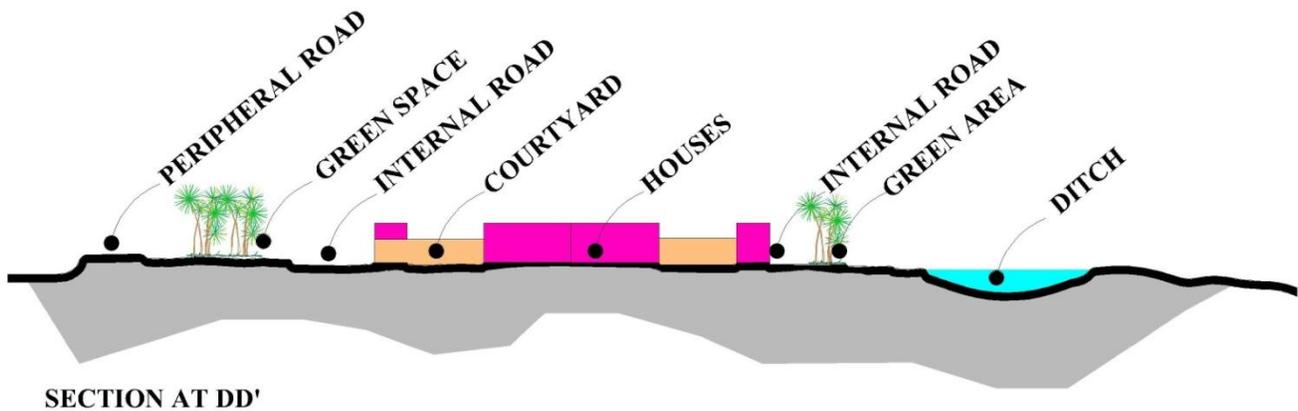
Sectional Details of Site Layout depicting disaster resilient features.
